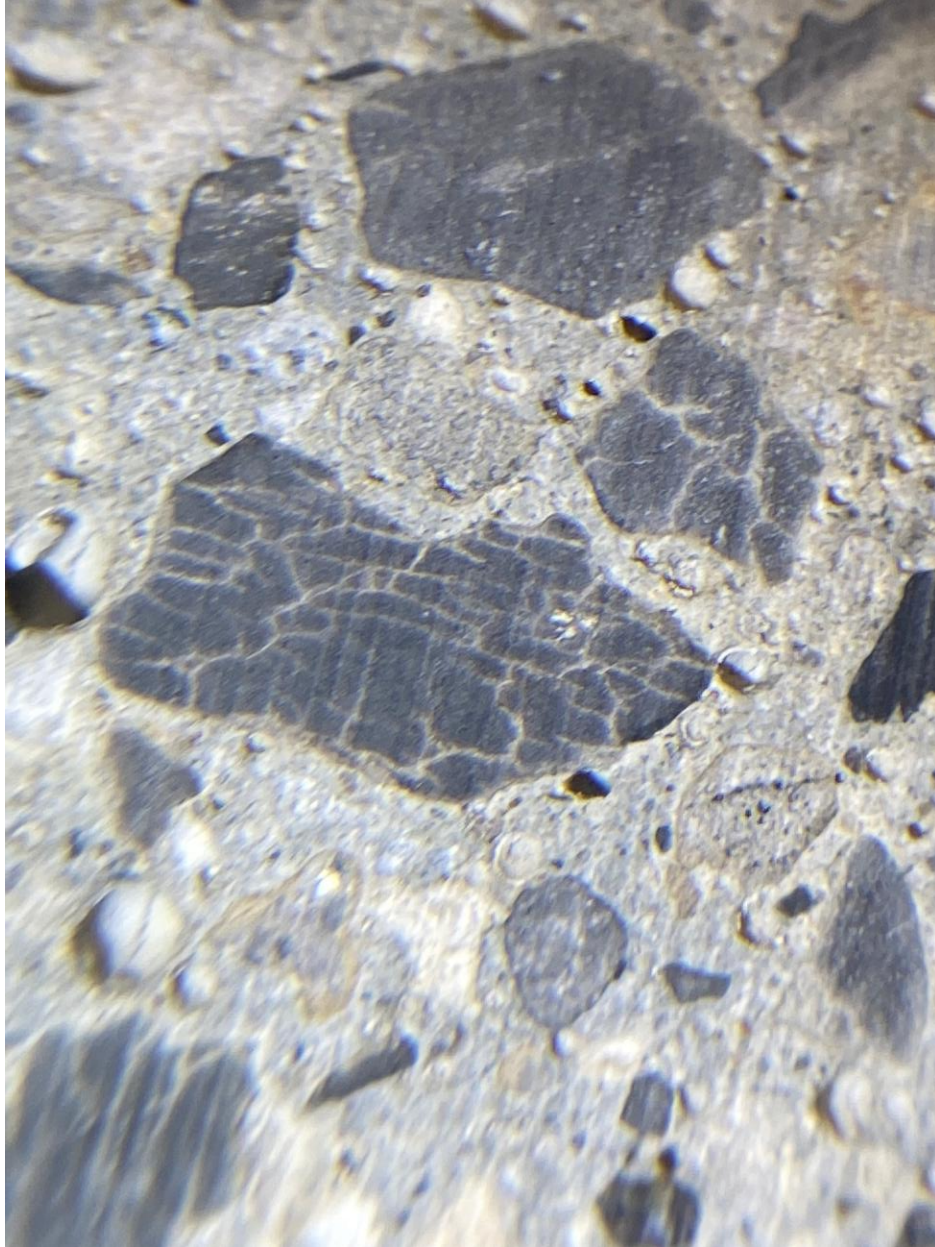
Aggregate in core 2 of lightweight concrete deck at bridge F-792 (1).
